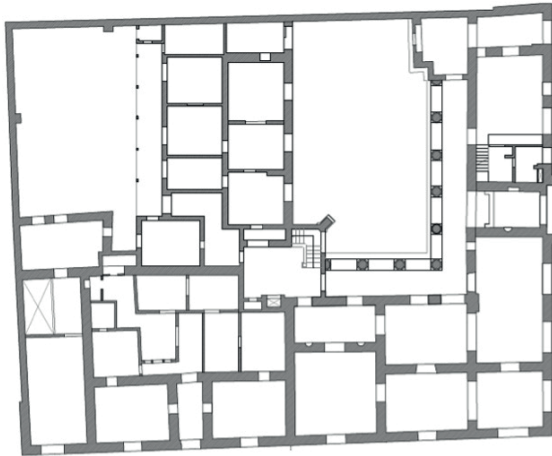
Structure plant existing situation after interventions in 1923-1930. (Source: The author).
